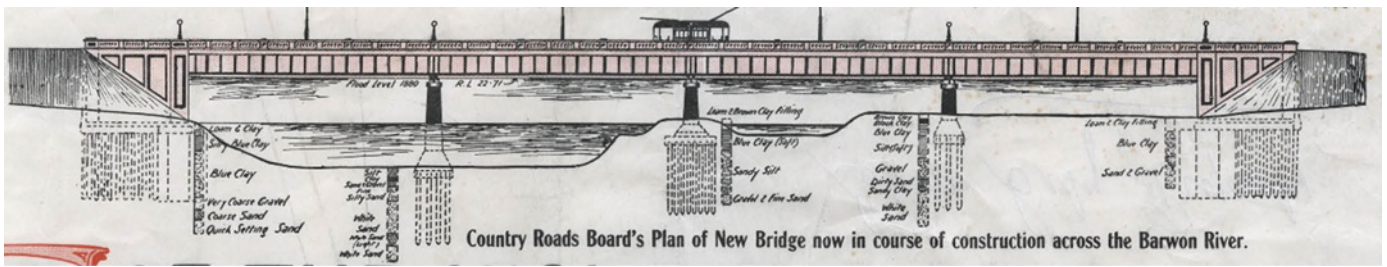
Elevation drawing of proposed Barwon Bridge, 1924. Source: Belmont Estate Subdivision Plan, 30 August 1924, GRS 2030/B30, Geelong Heritage Centre collection.
